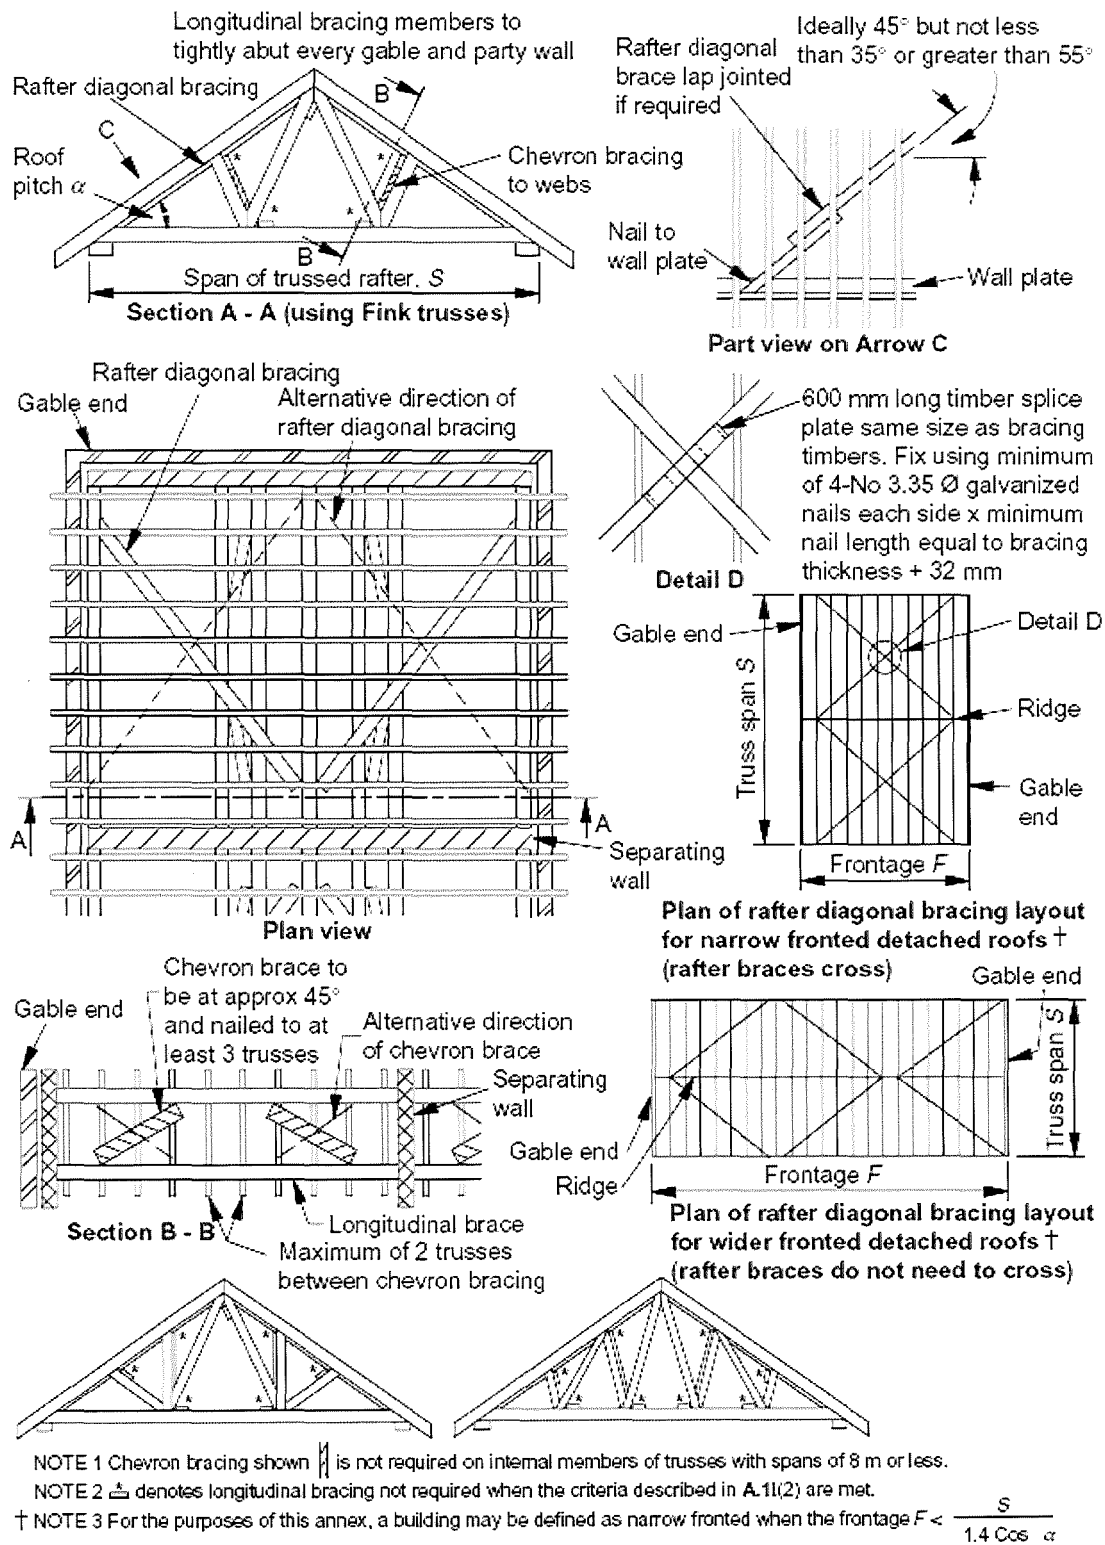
Standard bracing for rafter and web members of duopitch trussed rafters (BS 5268-3:1998 Figure A.1)
